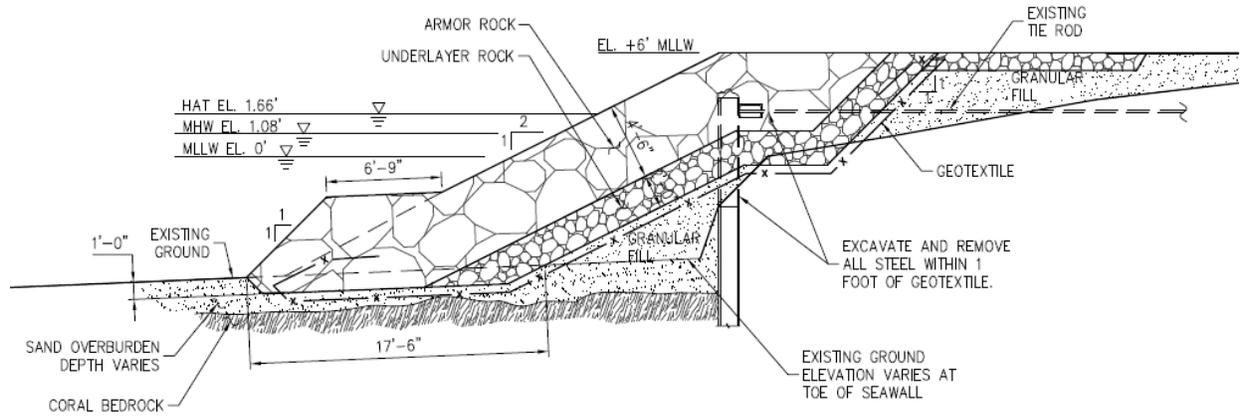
Cross-Section View of Typical Rock Revetment
